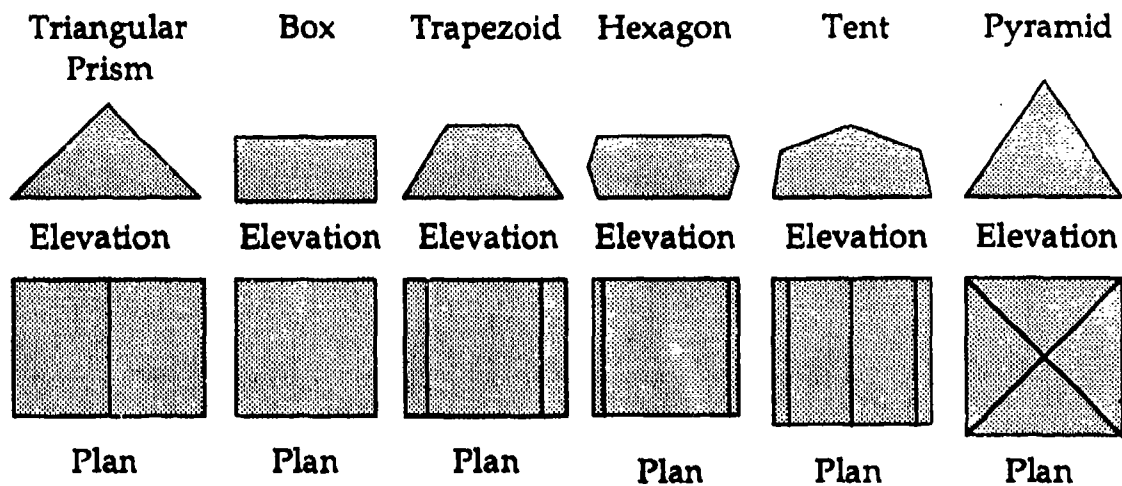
Plan and Elevation Views of Optimum Shapes.
